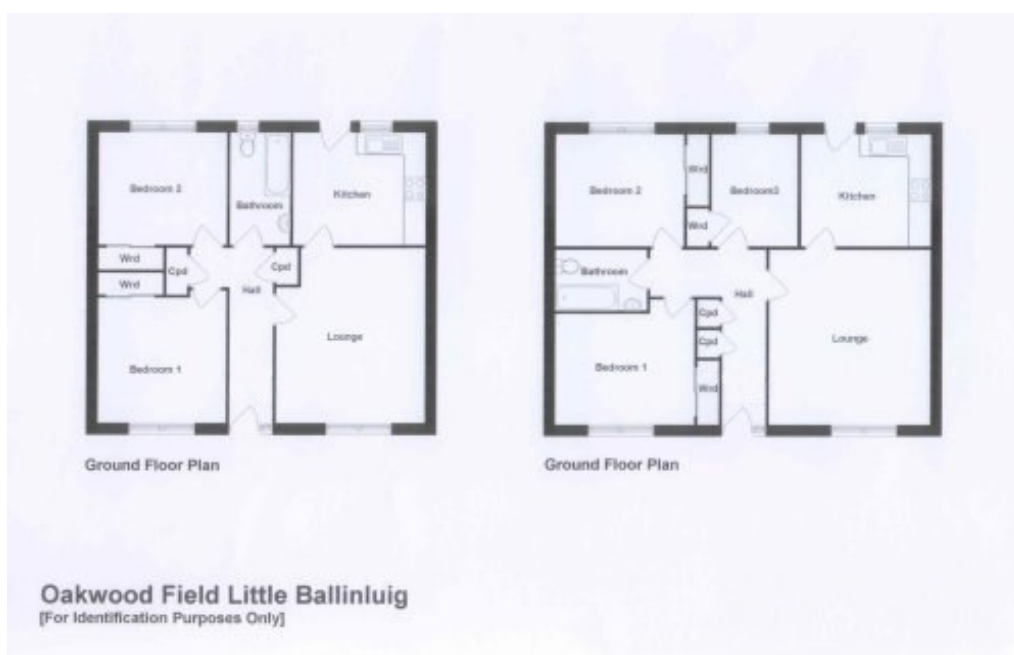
Lyon House Type (Left) & Tay House Type (Right)
